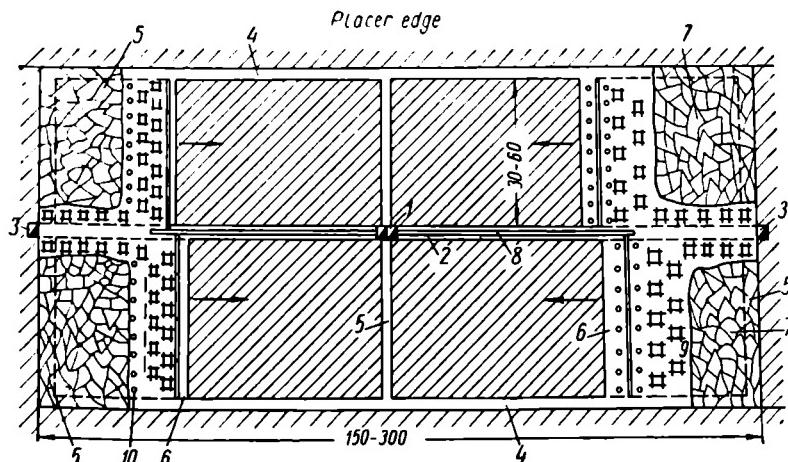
Pillar recovery by continuous faces (longwalls) in a placer
